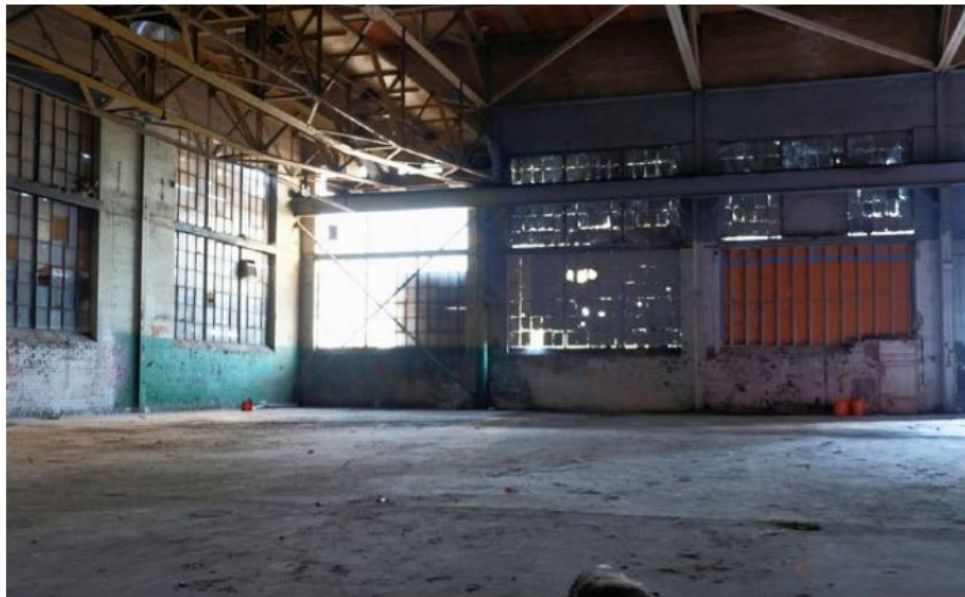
Interior view of 153 Eastern Avenue (Cleaning Room building), looking east (Philip Goldsmith Architect, 2025).
